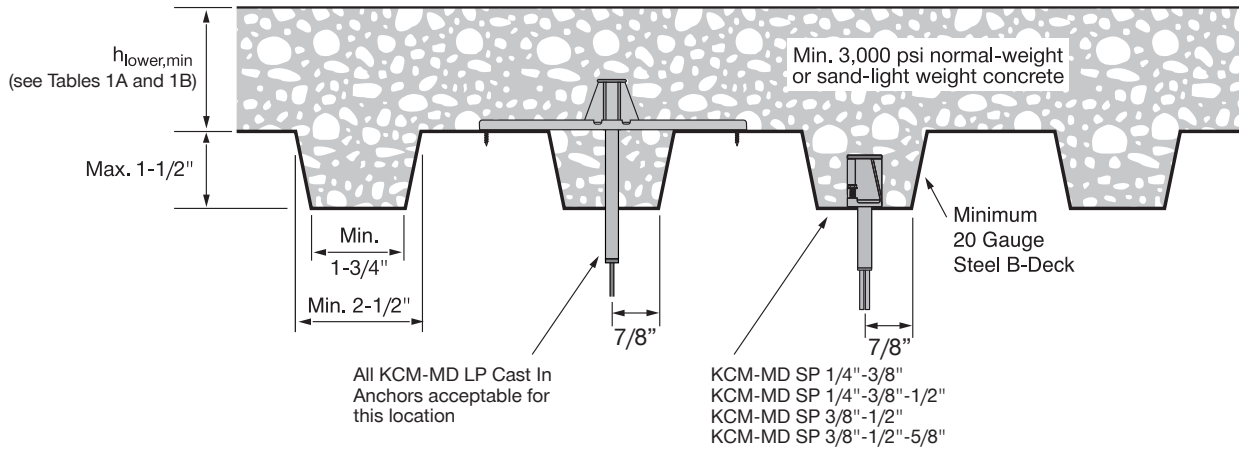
C — Installation in the soffit of concrete filled metal deck floor and roof assemblies-over lower flute (B-deck)
